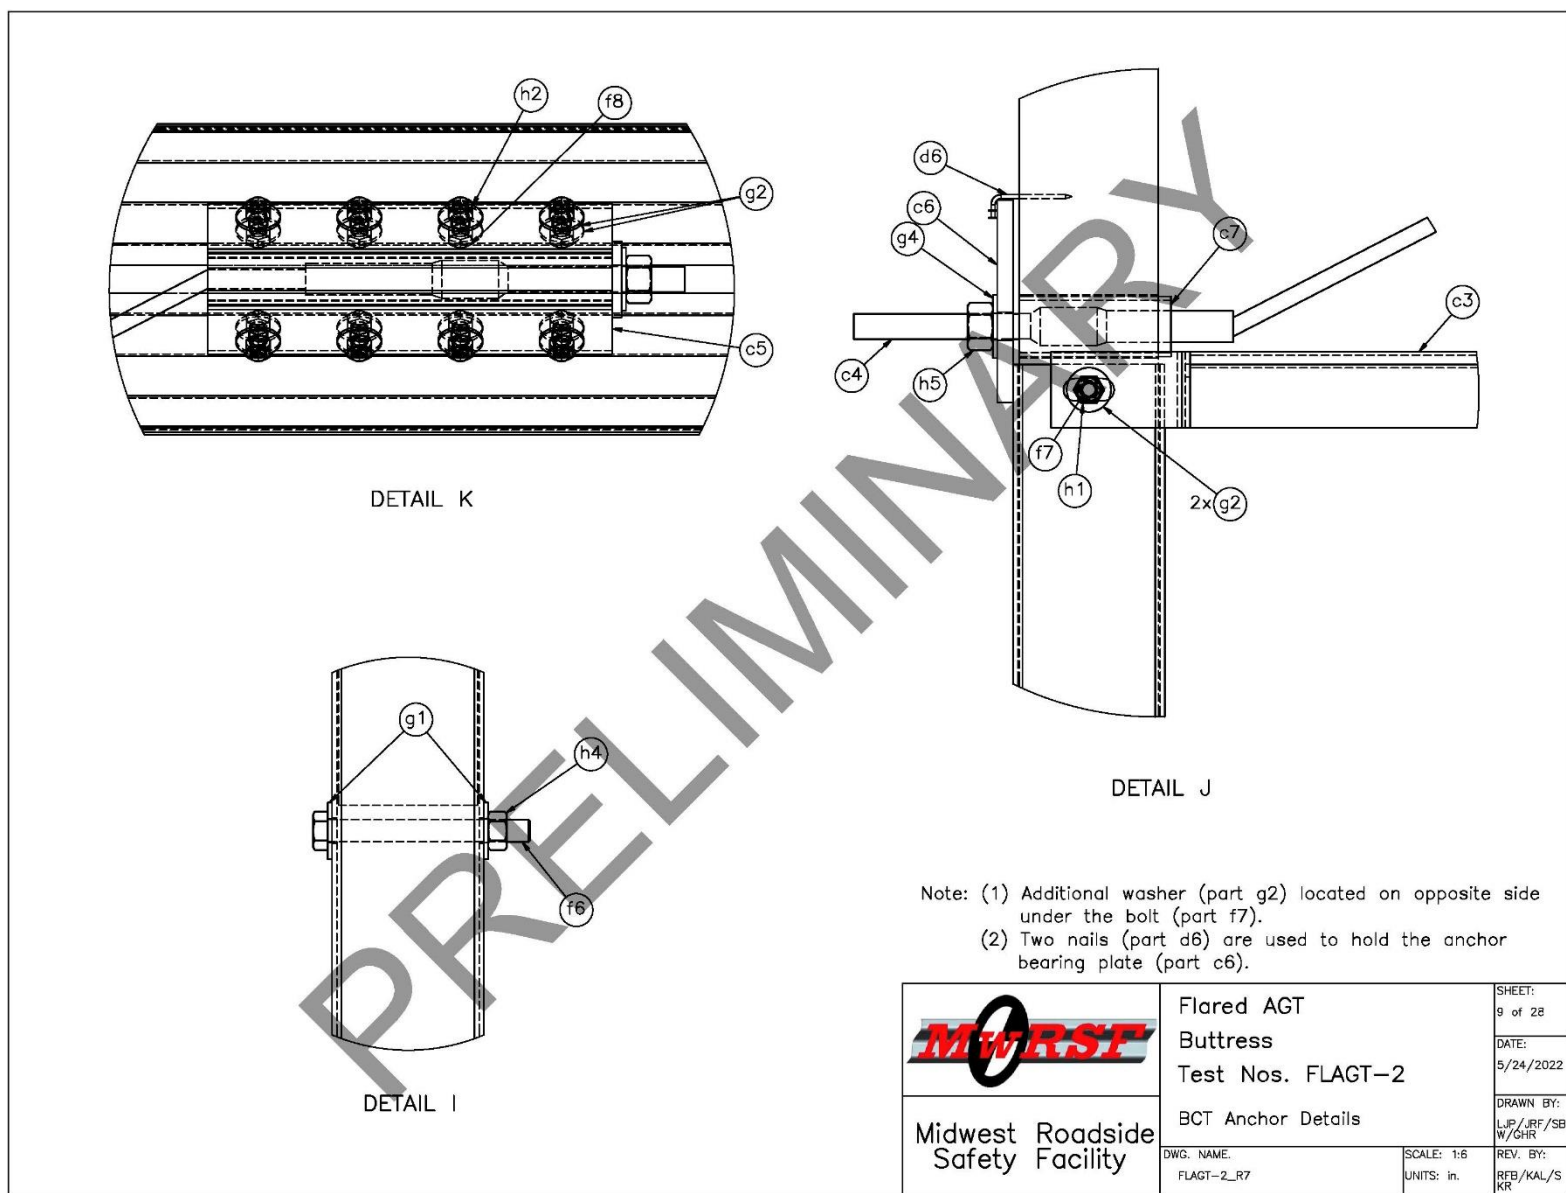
BCT Anchor Details, Test No. FLAGT-2
